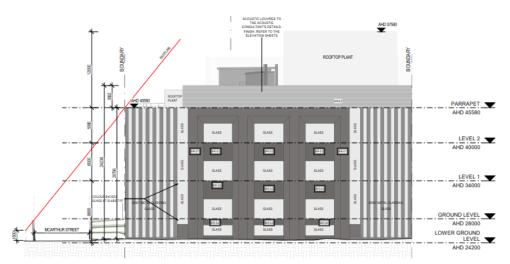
Detail of south elevation (Indwe Street) of proposed data centre
